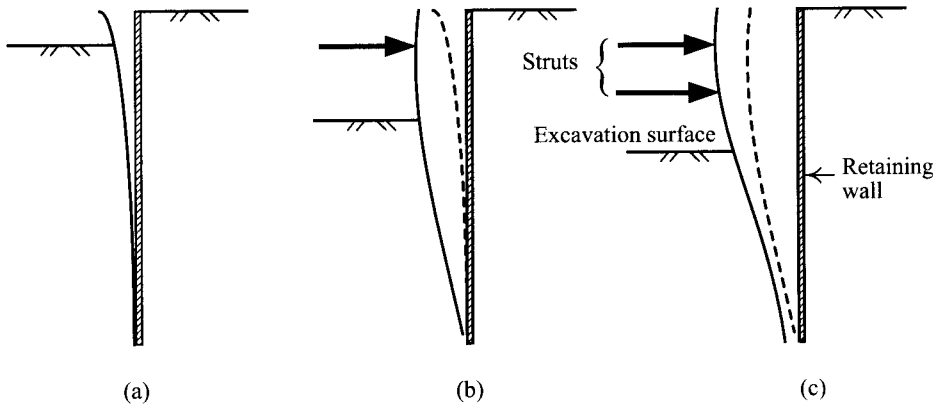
Relation between the shape of wall deformation and low strut stiffness: (a) first stage of excavation, (b) second stage of excavation, and (c) third stage of excavation.
